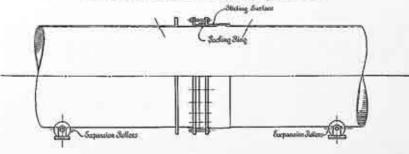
Typical Views of the 48-inch Pipe Line Construction:
